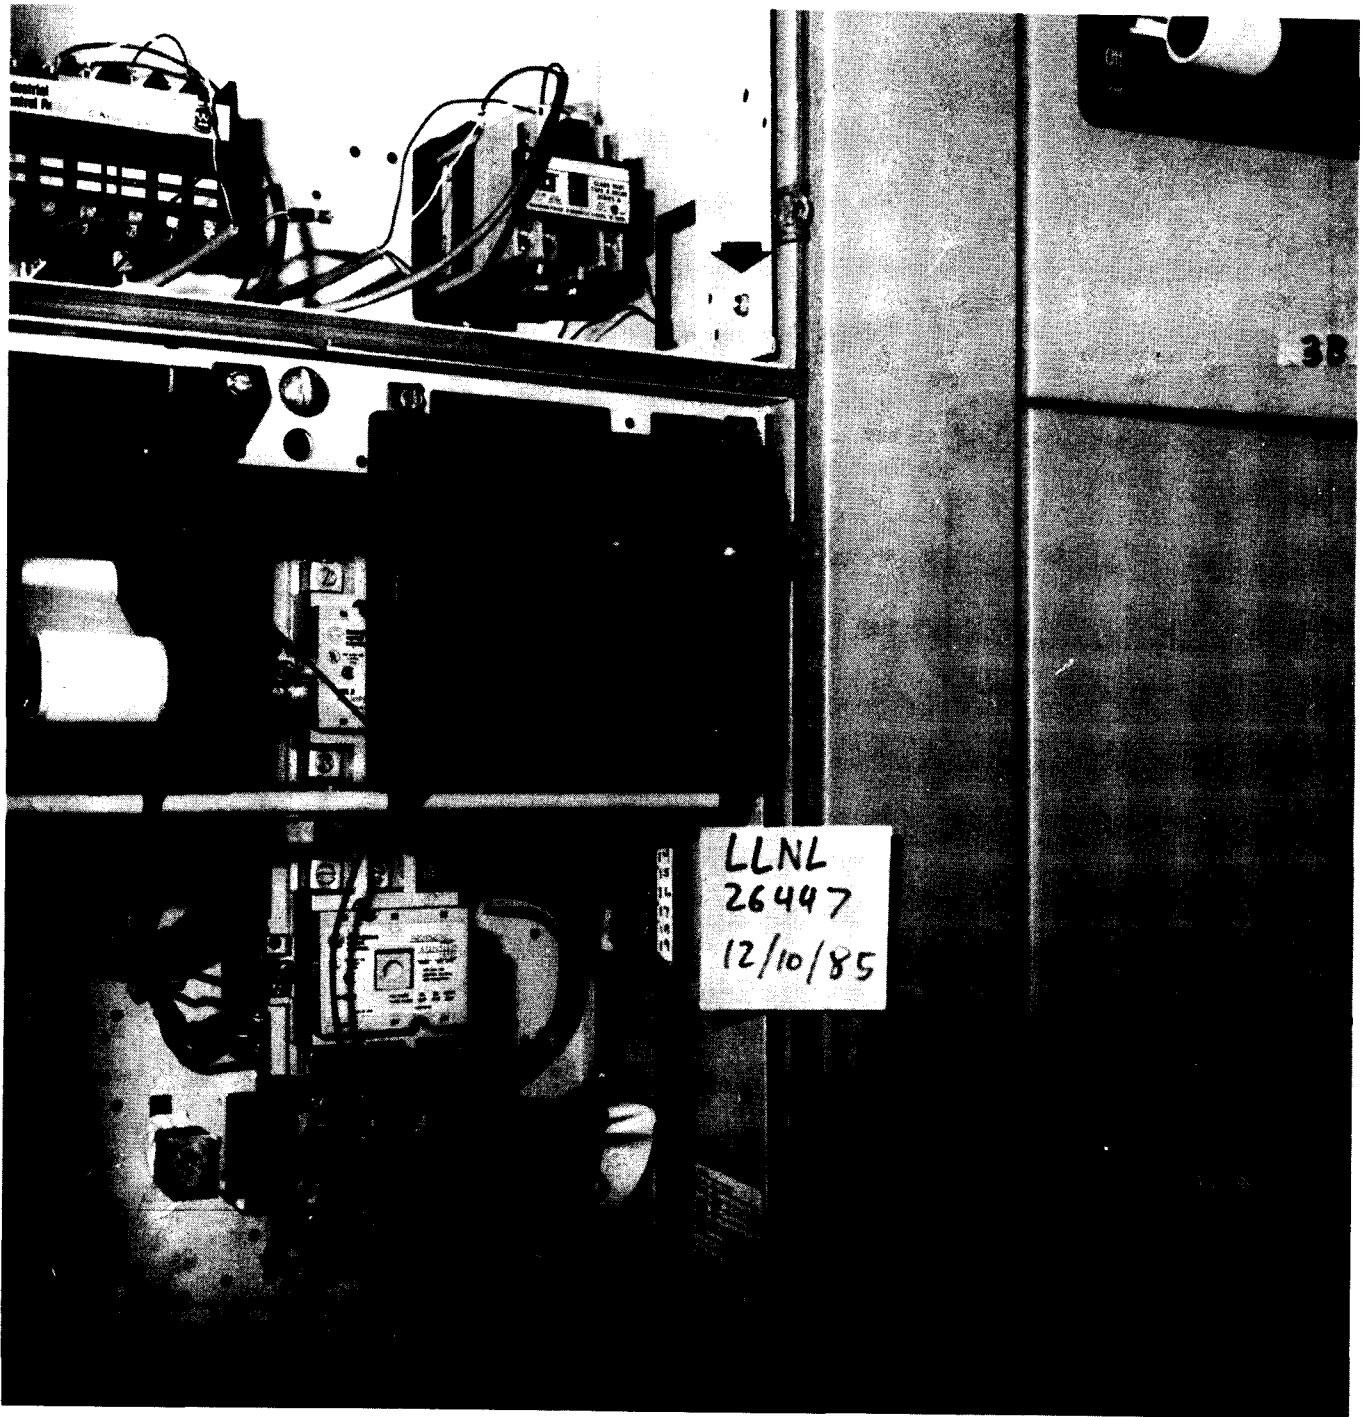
Detail of MCC draw-out units 2B and 2E, showing location of additional mounting screws.
